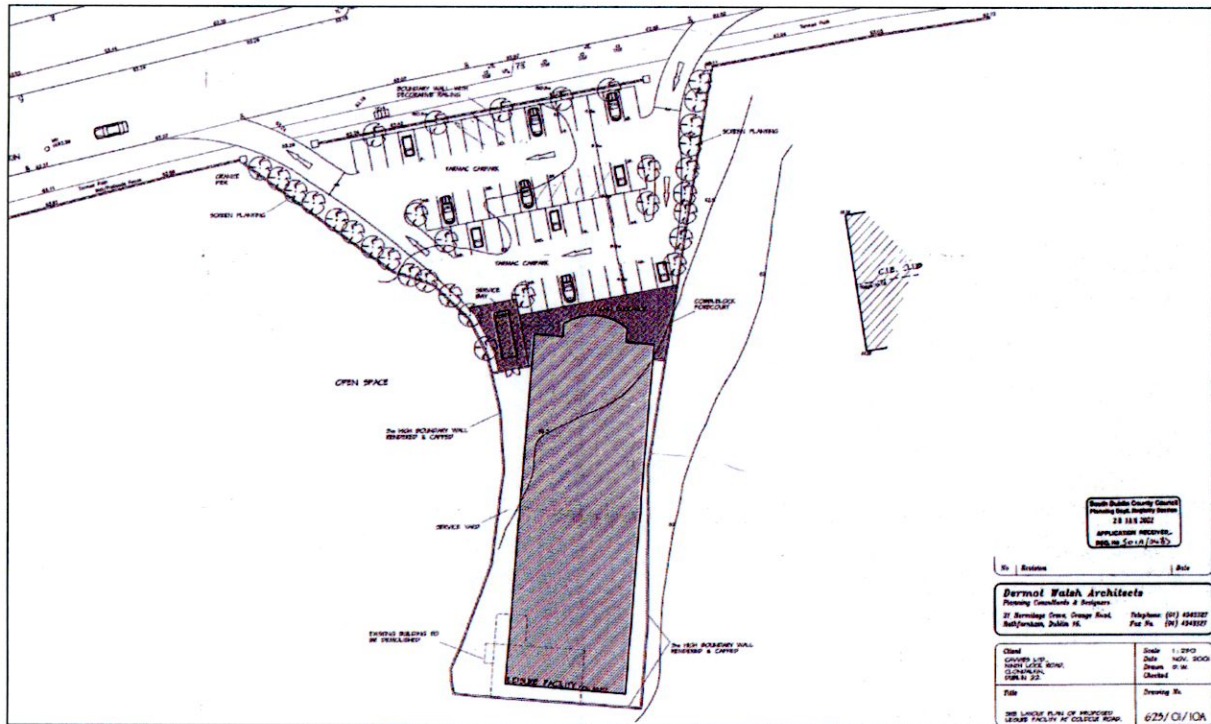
Extract of site layout plan granted under Reg. Ref. S01A/0485 (Drawing No. 623/01/10A). Site area shown at 0.4245 hectares with 53 no. car parking spaces provided and existing building to be demolished.
